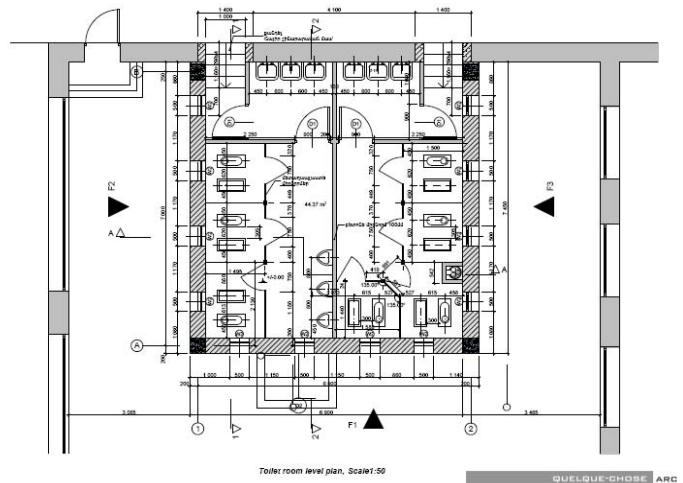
Floor plan of the toilet block; design: Quelque-Chose (source: AWHHE)
